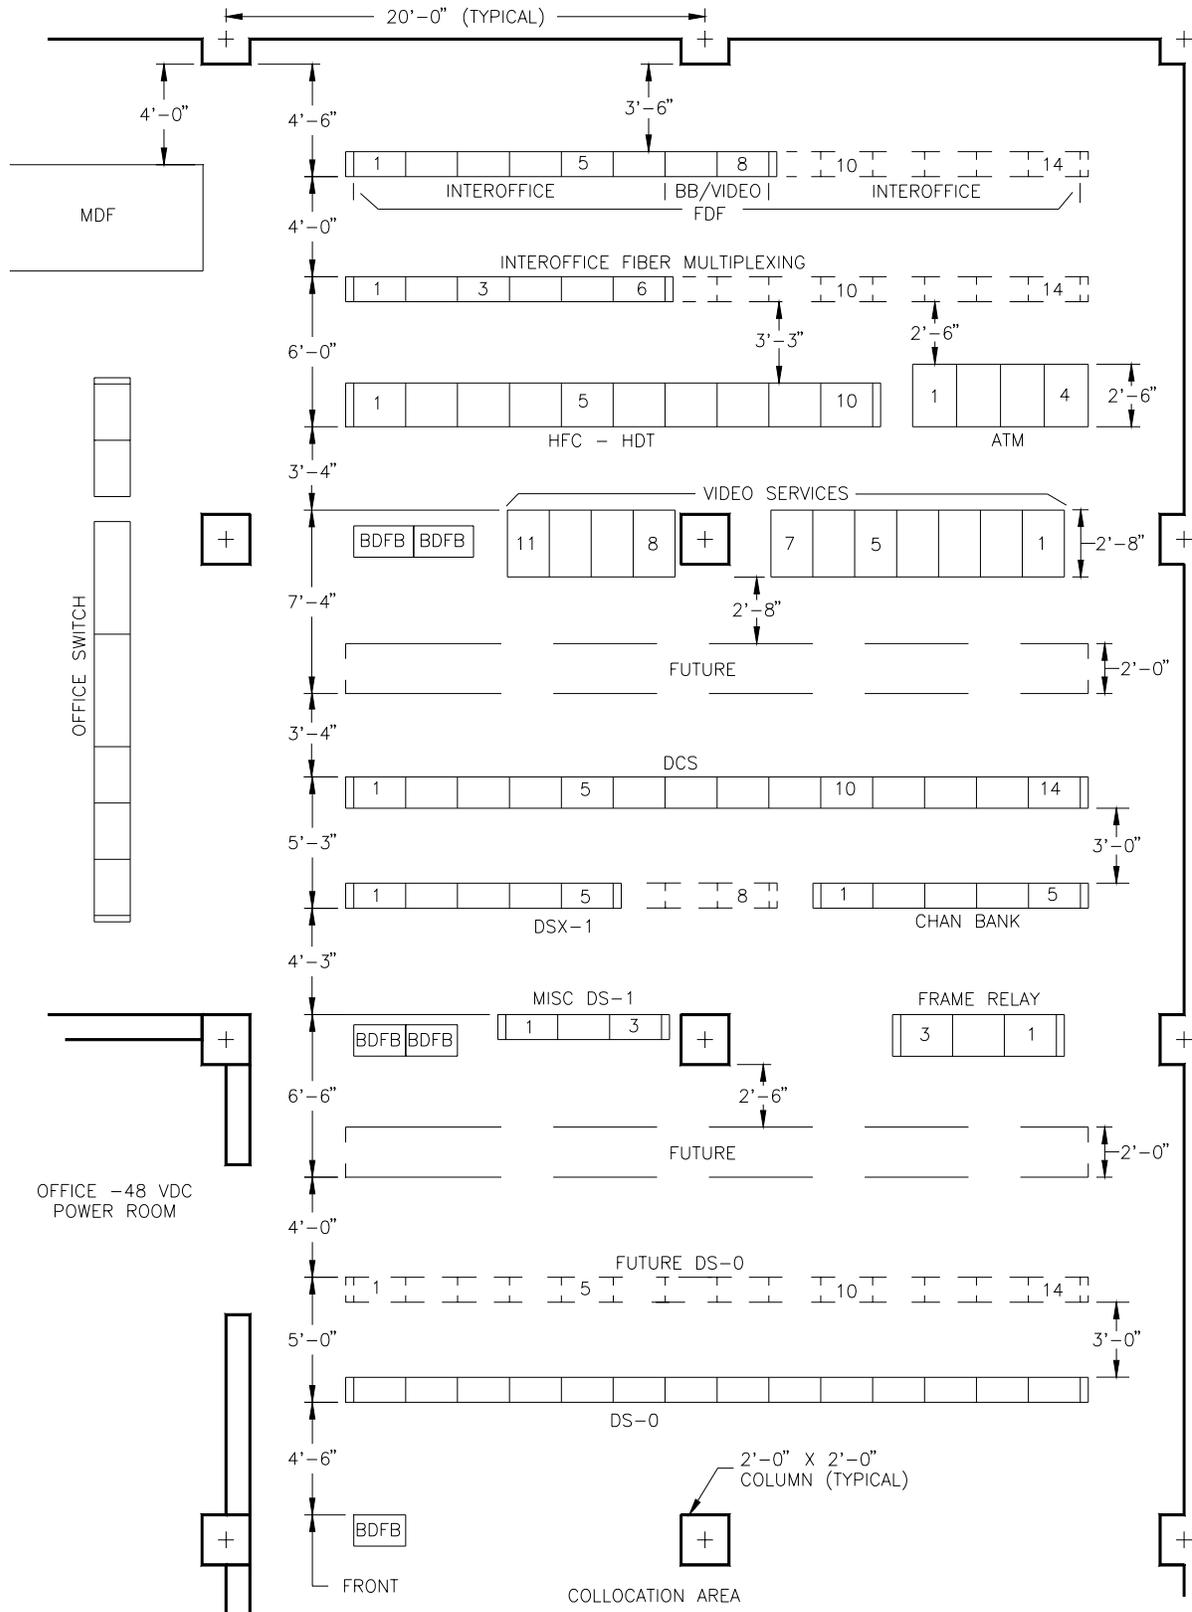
Typical Application Of Aisle Spacing Guidelines
